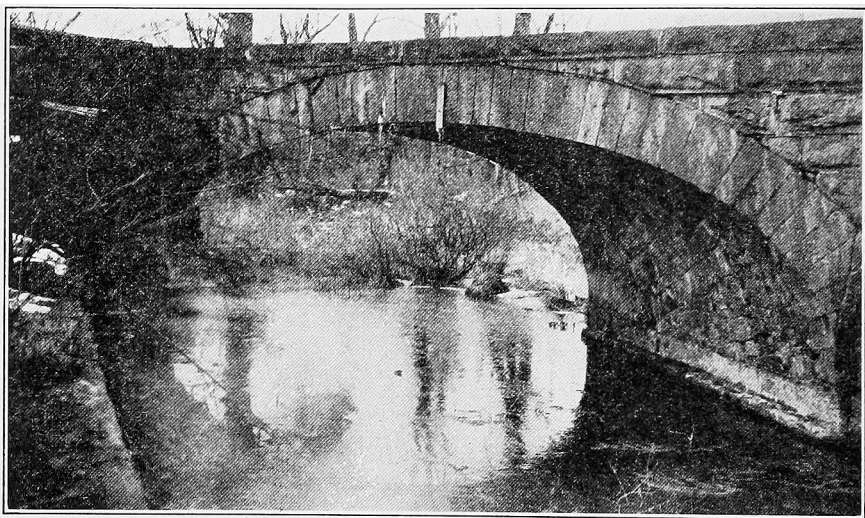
SKEW ARCH CARRYING RAILROAD OVER CANAL NEAR BROOKSVALE, CONN.
